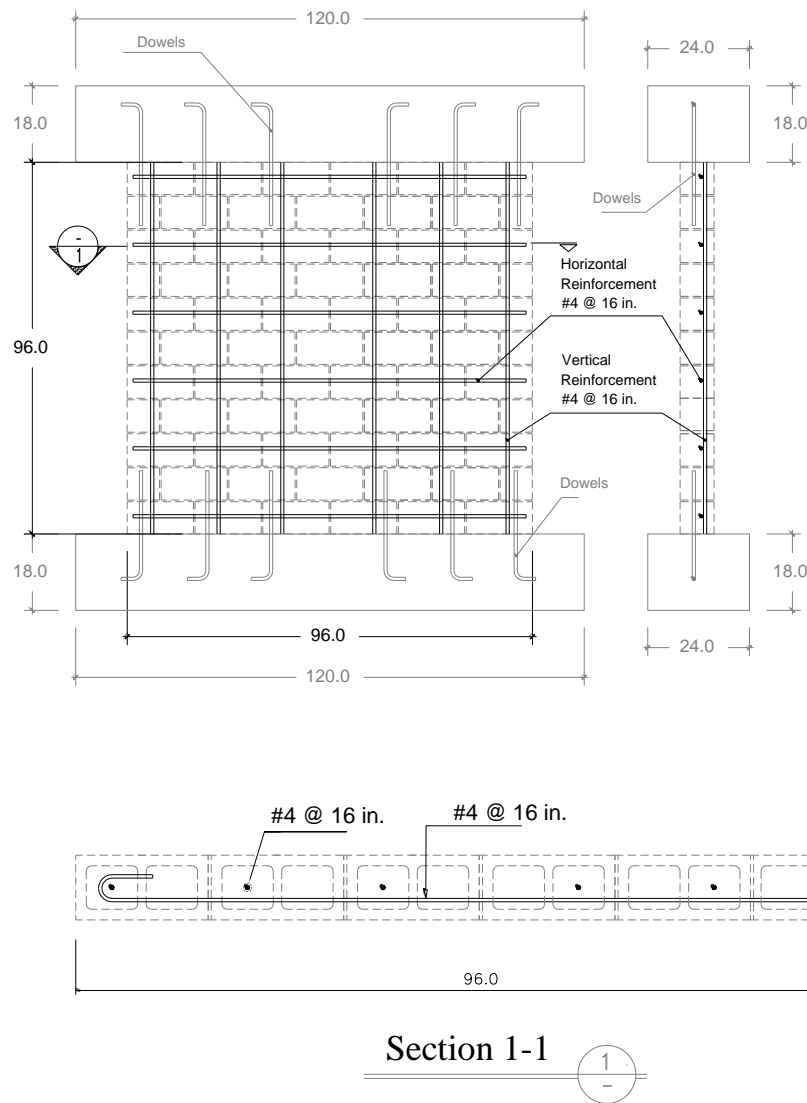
Detailing of Specimens PBS-4 and PBS-4G
